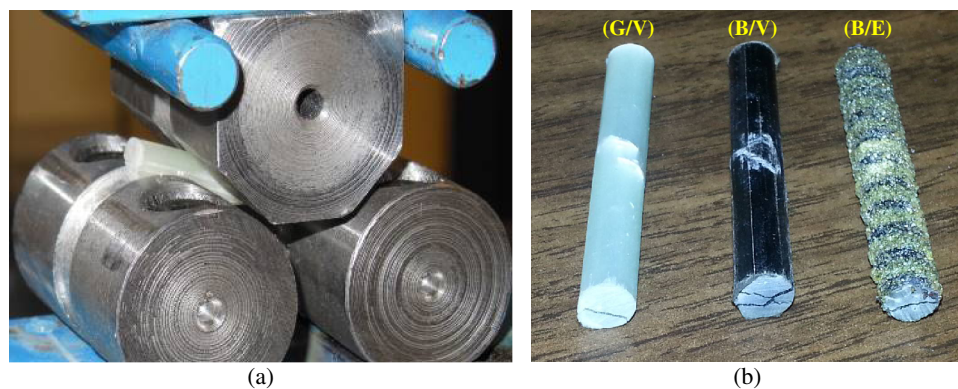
Setup for short-beam testing and typical failure mode: (a) test setup; (b) failure mode
